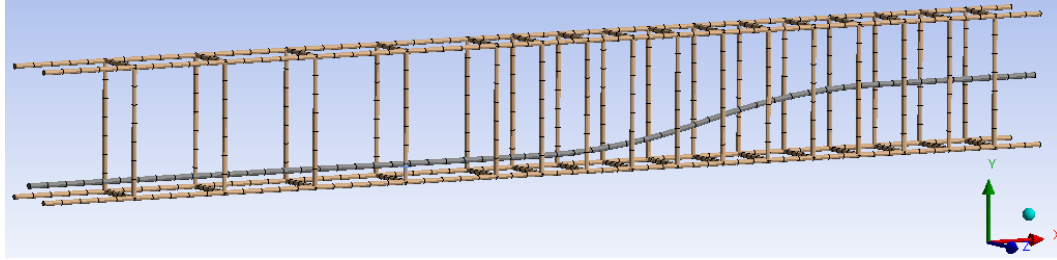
Finite elements model of active (prestressed) and passive (non-prestressed) steel reinforcement.
